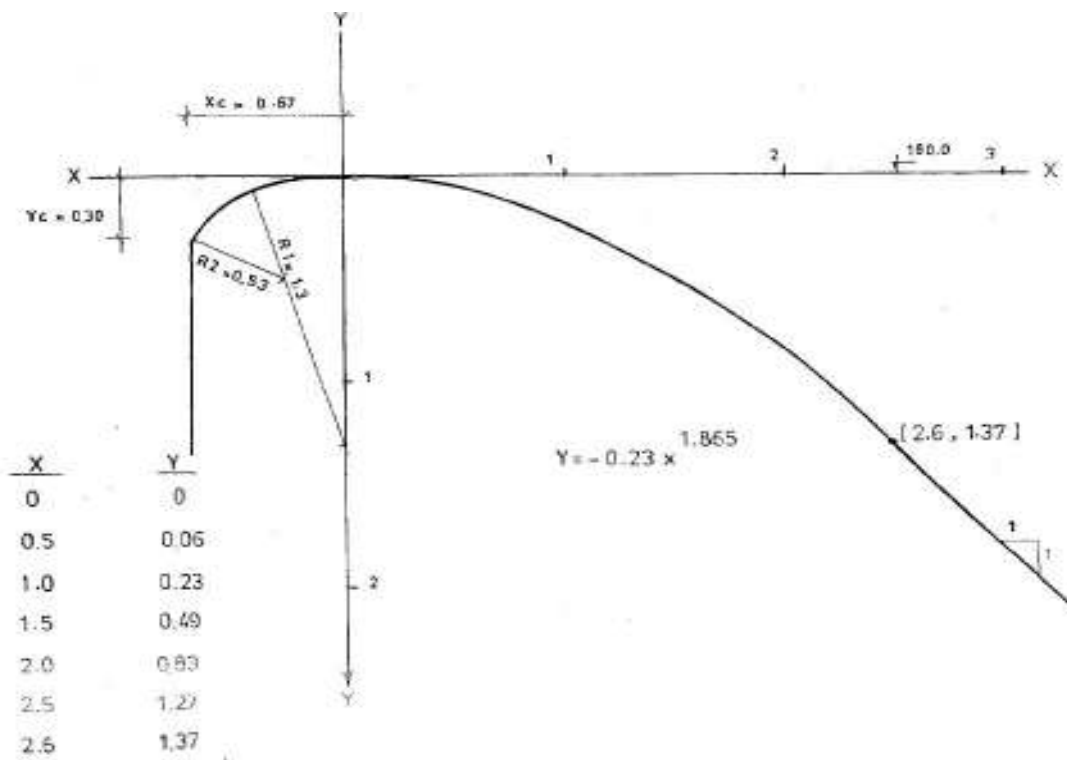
Details of Weir Crest and Ogee Spillway Shape, (Mandali Dam Design Report, 2004).
